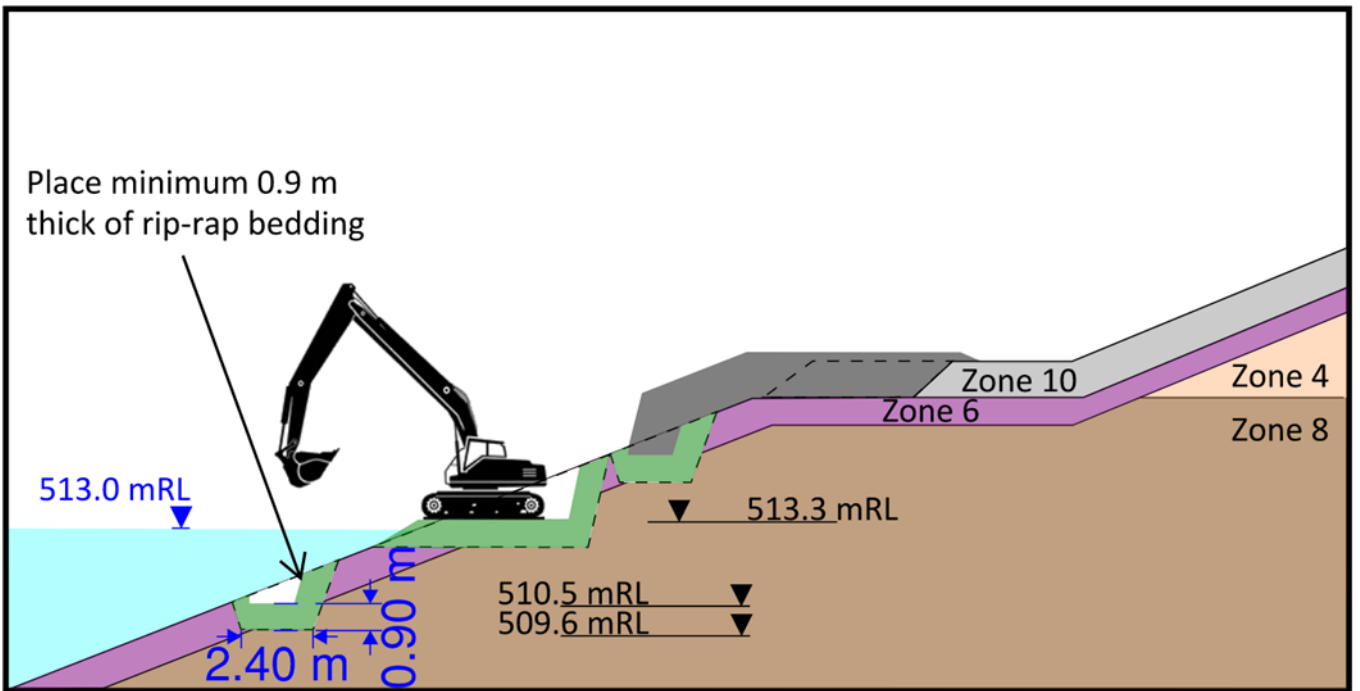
Schematic sketch – Tranche 2 – Main Dam – construction of key toe and installation of rip-rap bedding
